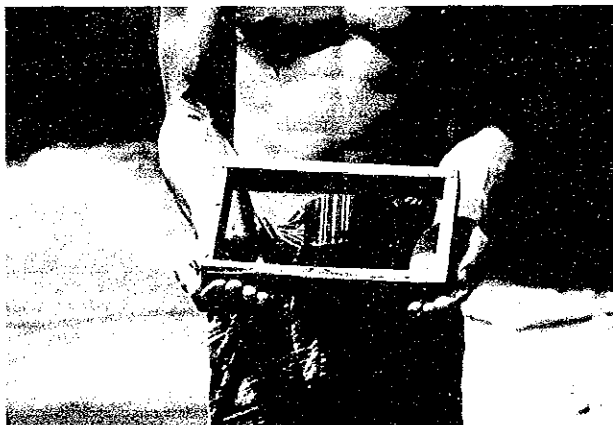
This Clay is Packed in the Wooden Frame, Size of Brick: 16×10×23 cm
